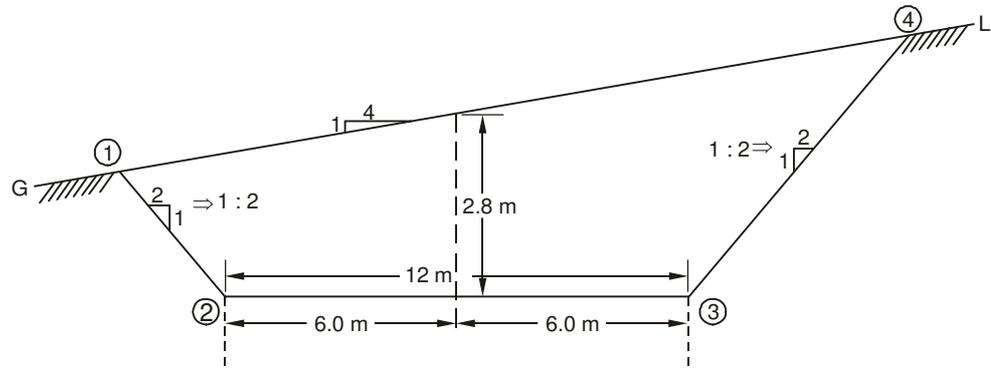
Given Cross-section of a Road Entirely in Cutting (Example 1.1)
